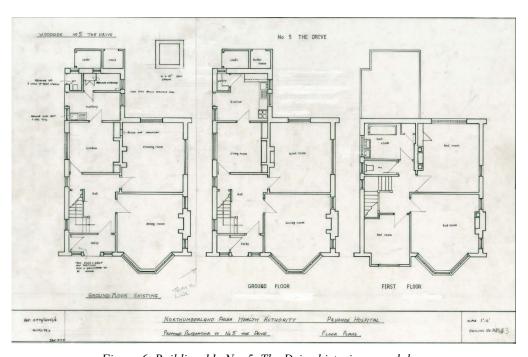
Building 11: No. 5, The Drive historic groundplan.
